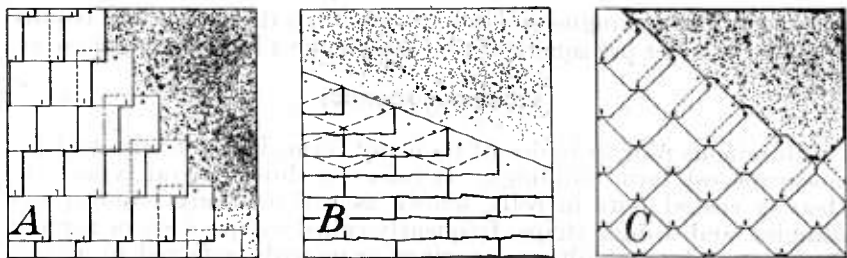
Types of asbestos shingles: A, Dutch, or side, lap; B, American, or rectangular; C, French, or hexagonal.
